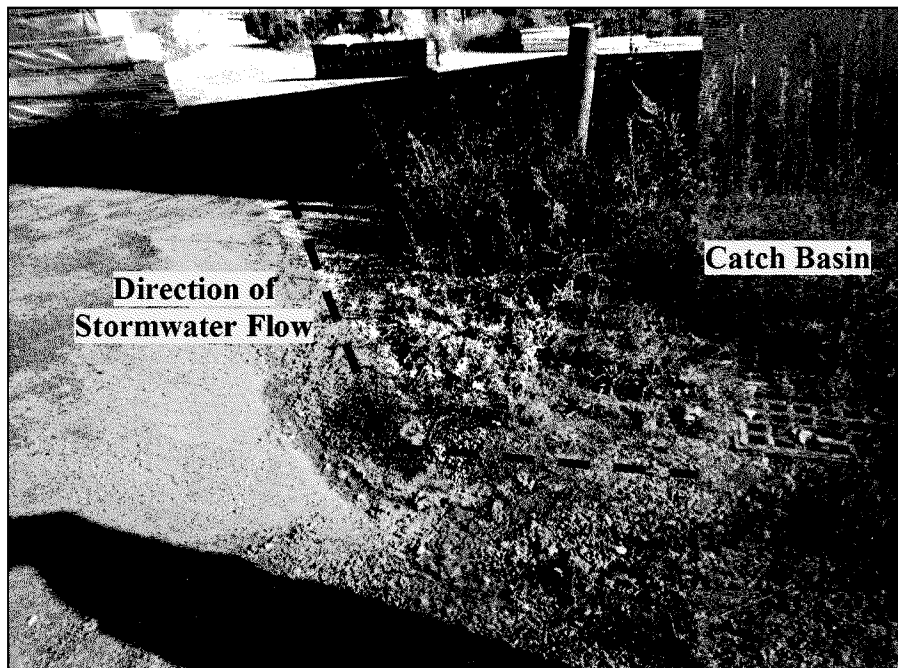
View, facing north, of the drainage area to Outfall 003.
